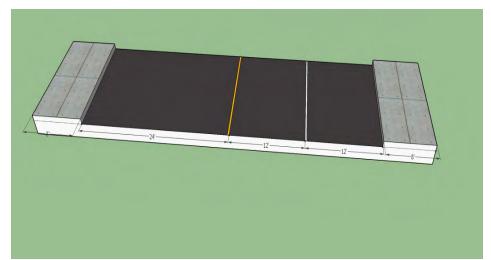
Current design of Maynard Terrace bridge over I-20 between East Atlanta and Kirkwood, looking northeast
